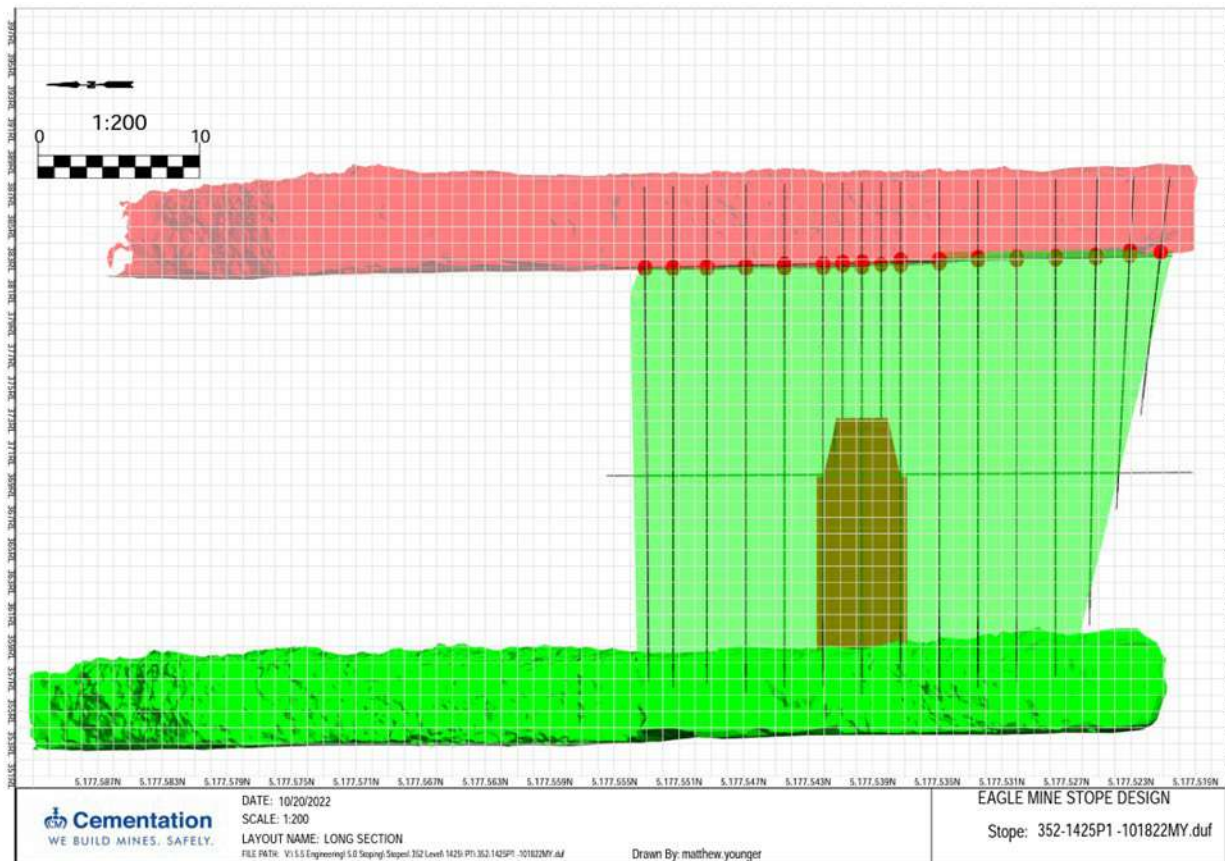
Typical Longhole Drilling Layout in a TSLOS Stope – Longitudinal Section
